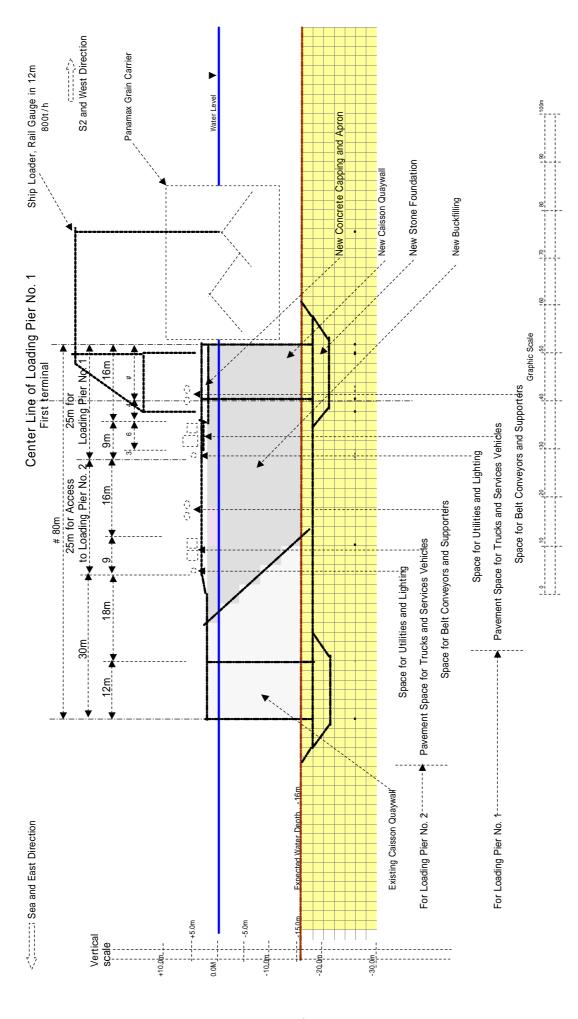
Typical Section of Grain Loading Pier, Section 1-1
